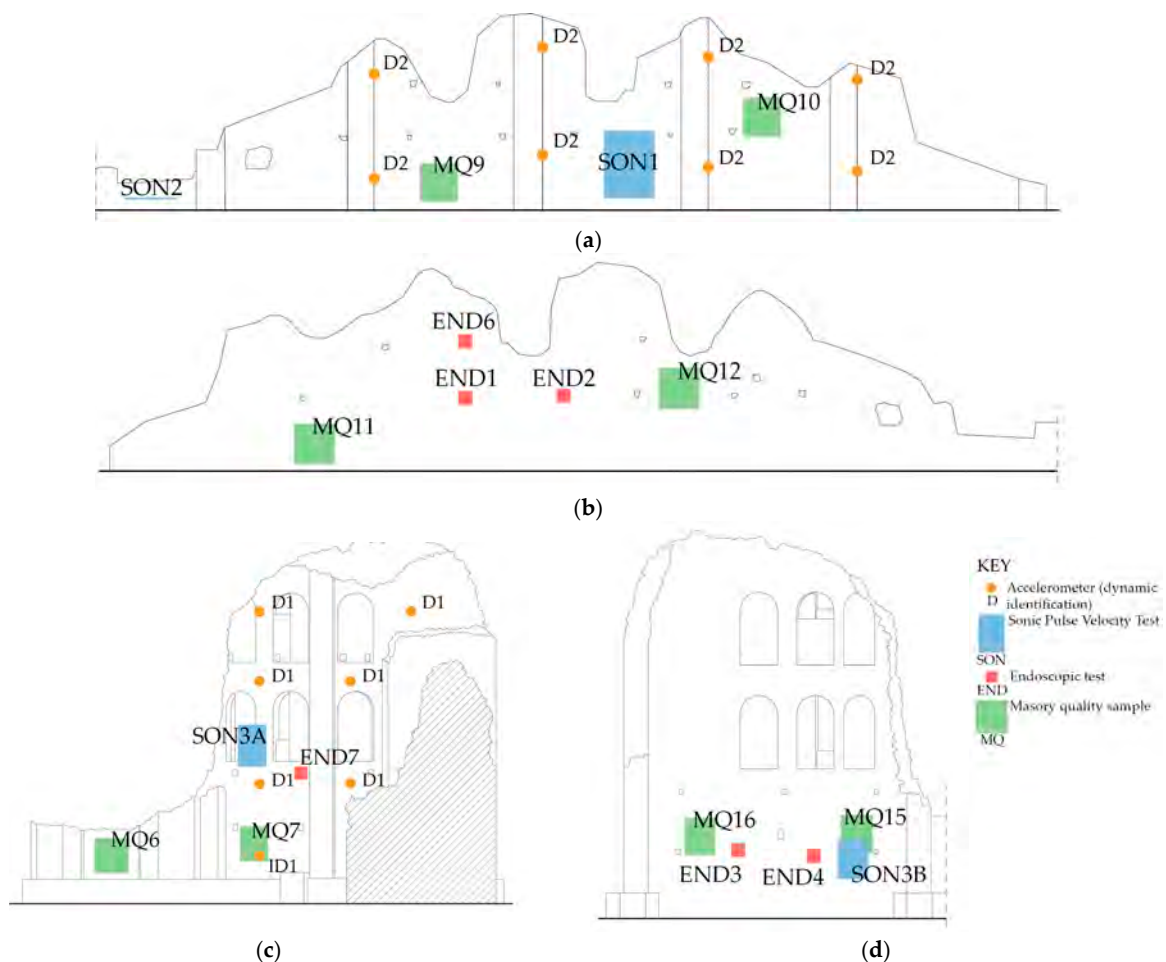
Investigation plan for the walls of S. Giovanni: (a) north wall, external elevation; (b) north wall, internal elevation; (c) main apse, external elevation; (d) main apse, internal elevation.
